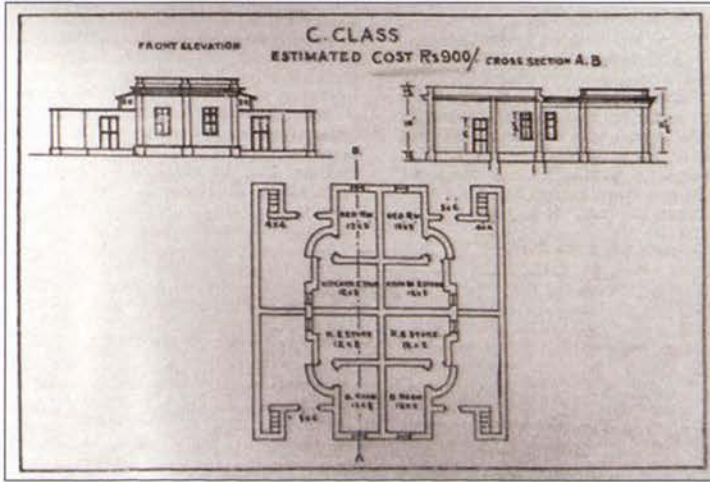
Plan and elevation of the ideal two room houses, built by the Hyderabad City Improvement Board in 1914.<sup>24</sup>
